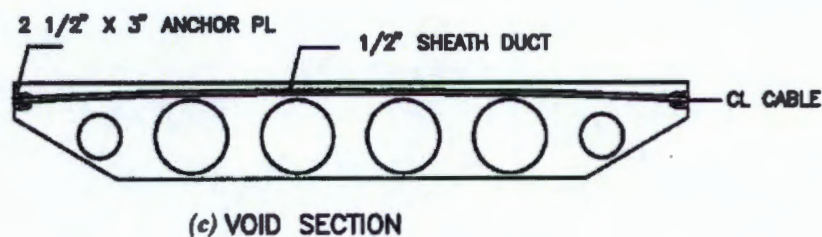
Typical transverse prestressing layout of a voided slab (Sen *et al.*, 1993).
